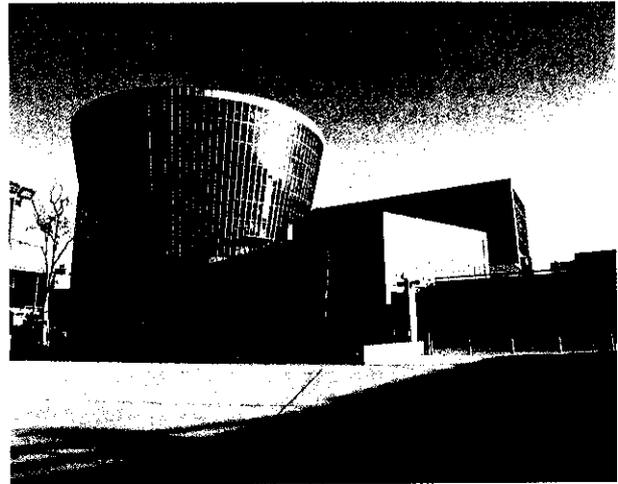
A perspective view of Suntory Museum: R30-2 panels of 1.5 mm thick have been used as outer wall
